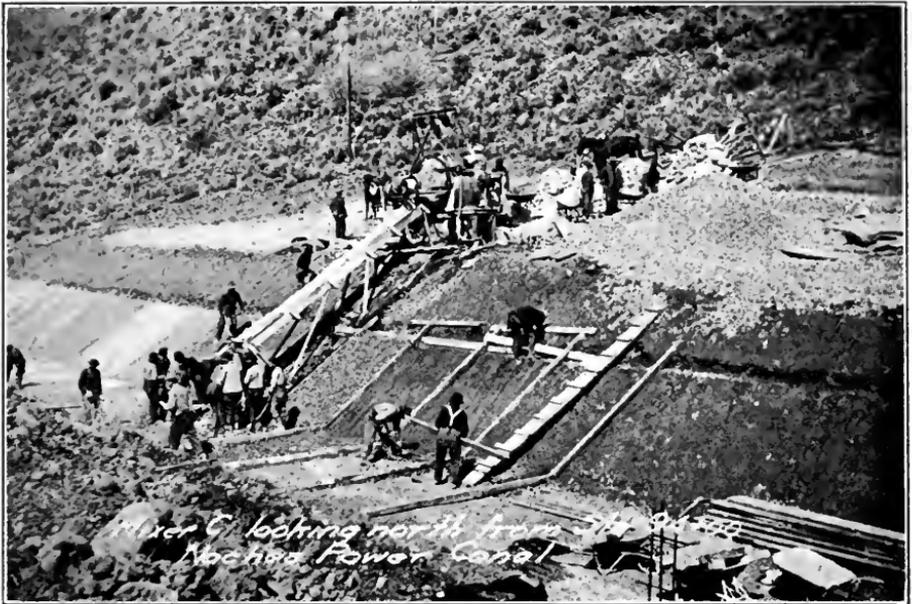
FIG. A.—Placing concrete lining. Naches Power Canal, Wash.
